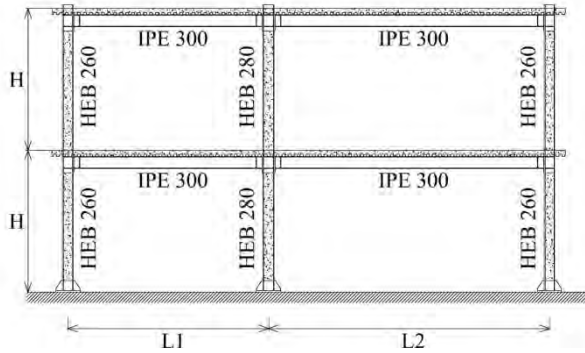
Elevation of the analysed PR steel-concrete composite frame.
